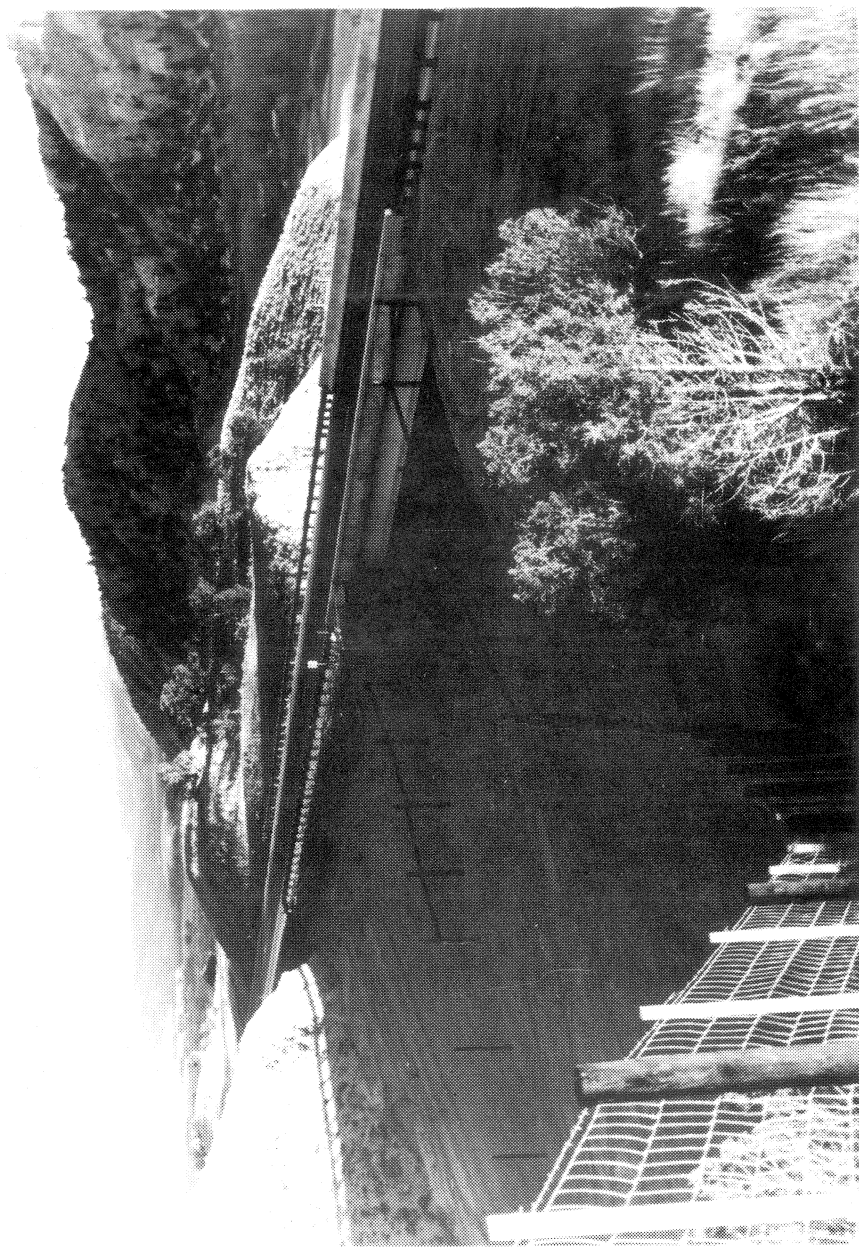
The Eagle West 2 bridge underpass under the west bound lanes of I-70. The 2.44-m fencing adjoins the bridge abutments. Photo by D. F. Reed.
